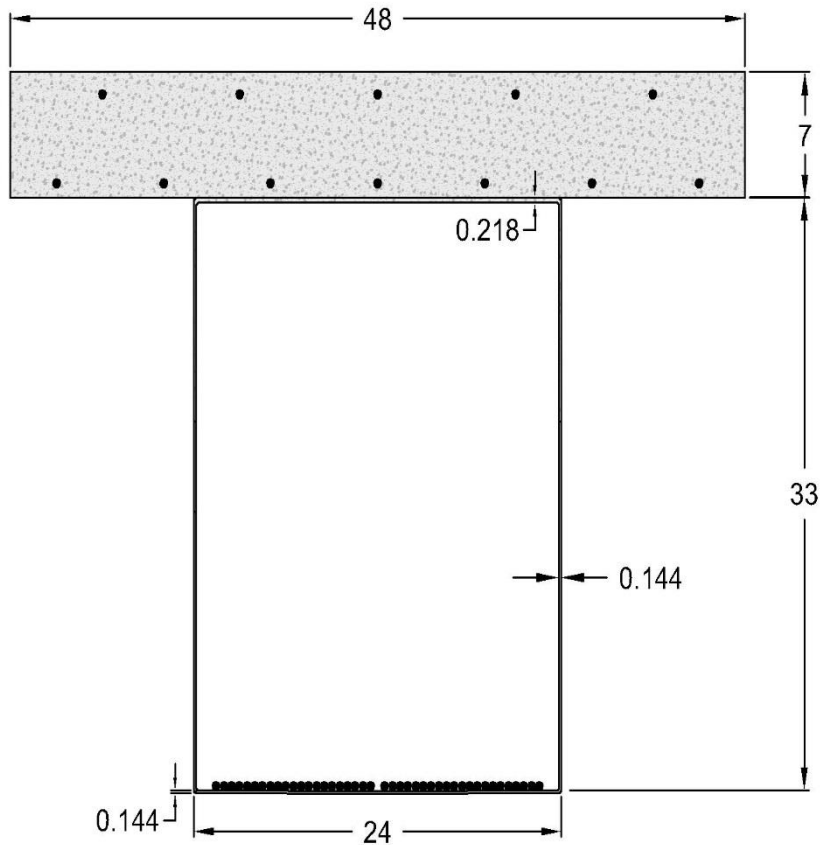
Cross section of HCB without concrete arch (Dimensions in inches)
